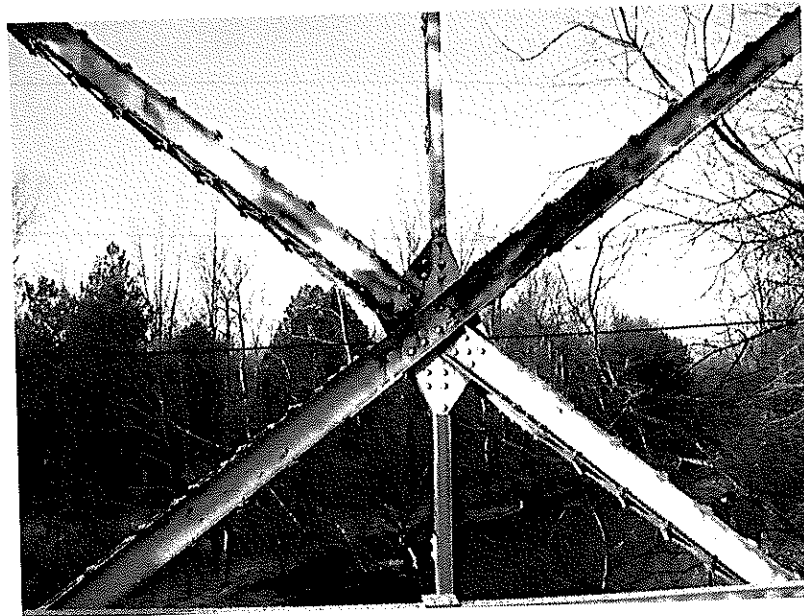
View to the West from the Midpoint Centreline of the Collingwood Street Bridge Showing Superstructure Detail and Corrosion
